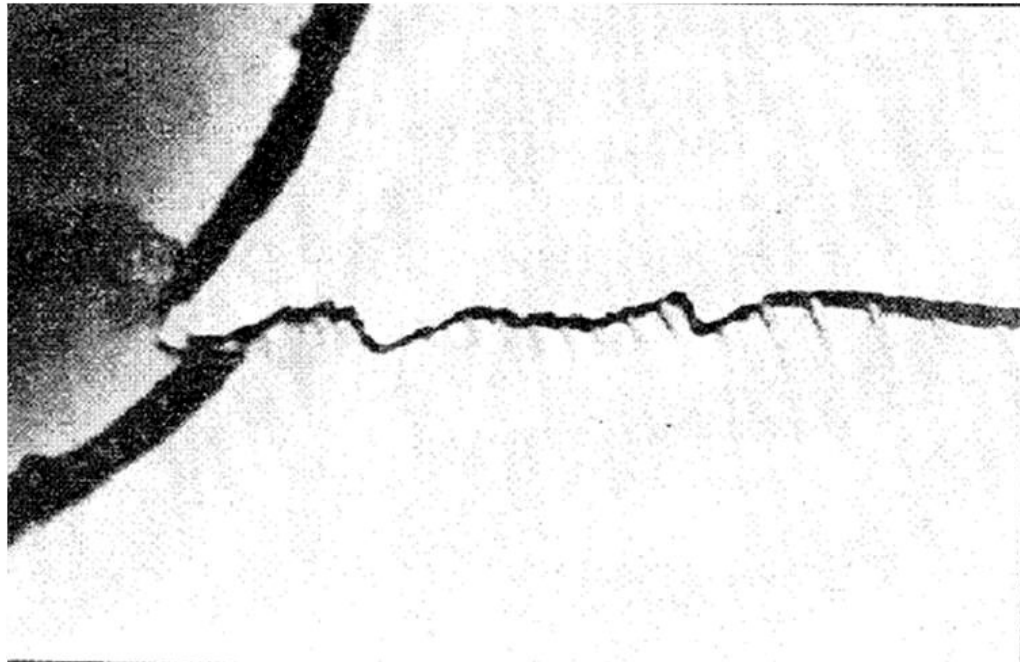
Transverse Cracks in Pipe Culvert
